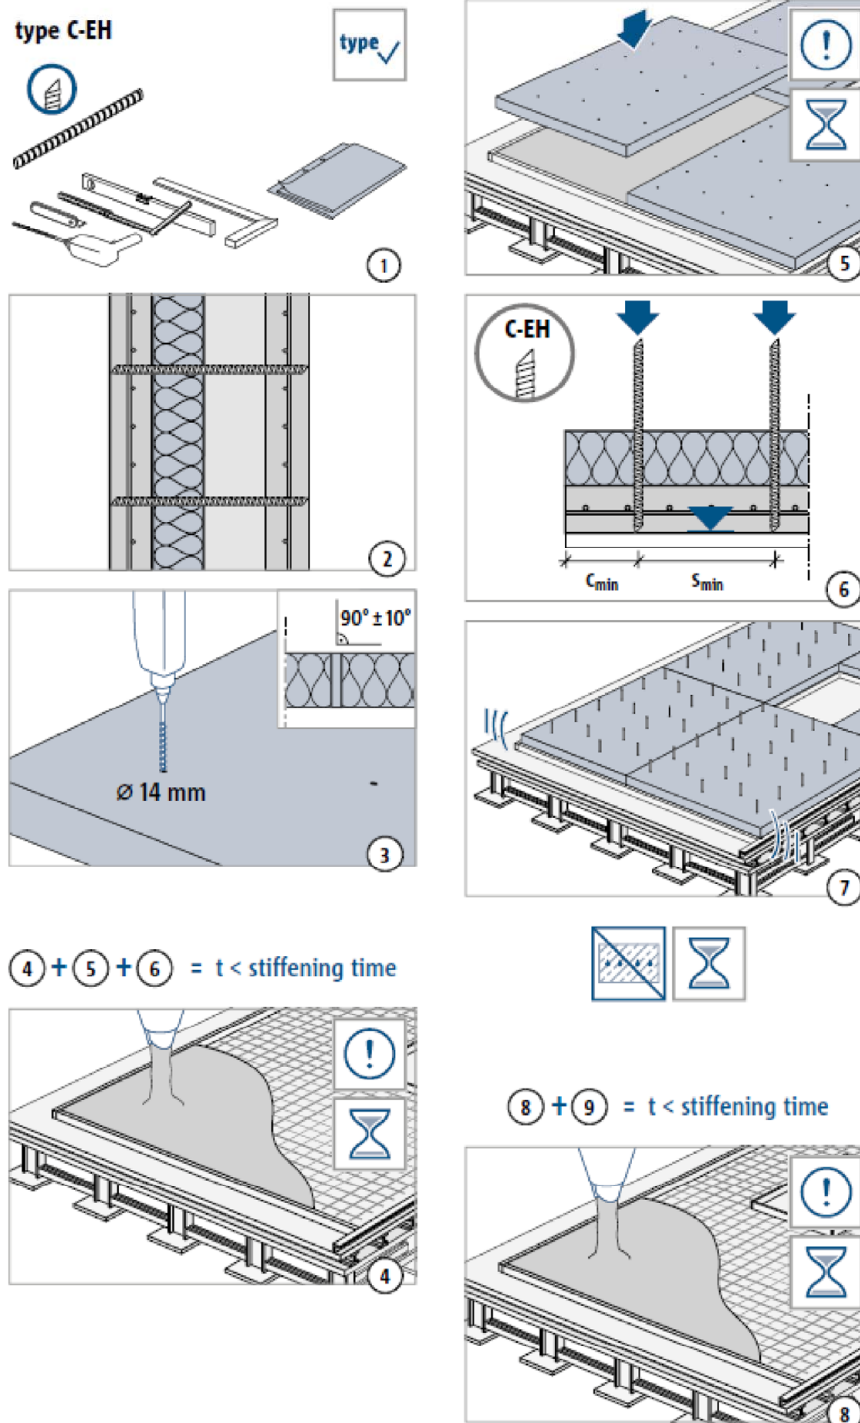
Installation instruction - Schöck Isolink® for element wall – page 1
